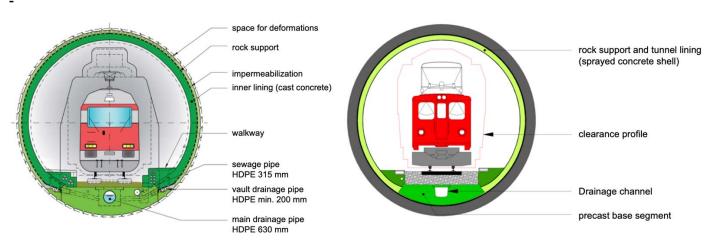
Typical Tunnel cross sections for the double lined Gotthard Base Tunnel (left) and the single lined Vereina Tunnel (right) (Source: Amberg Engineering)
